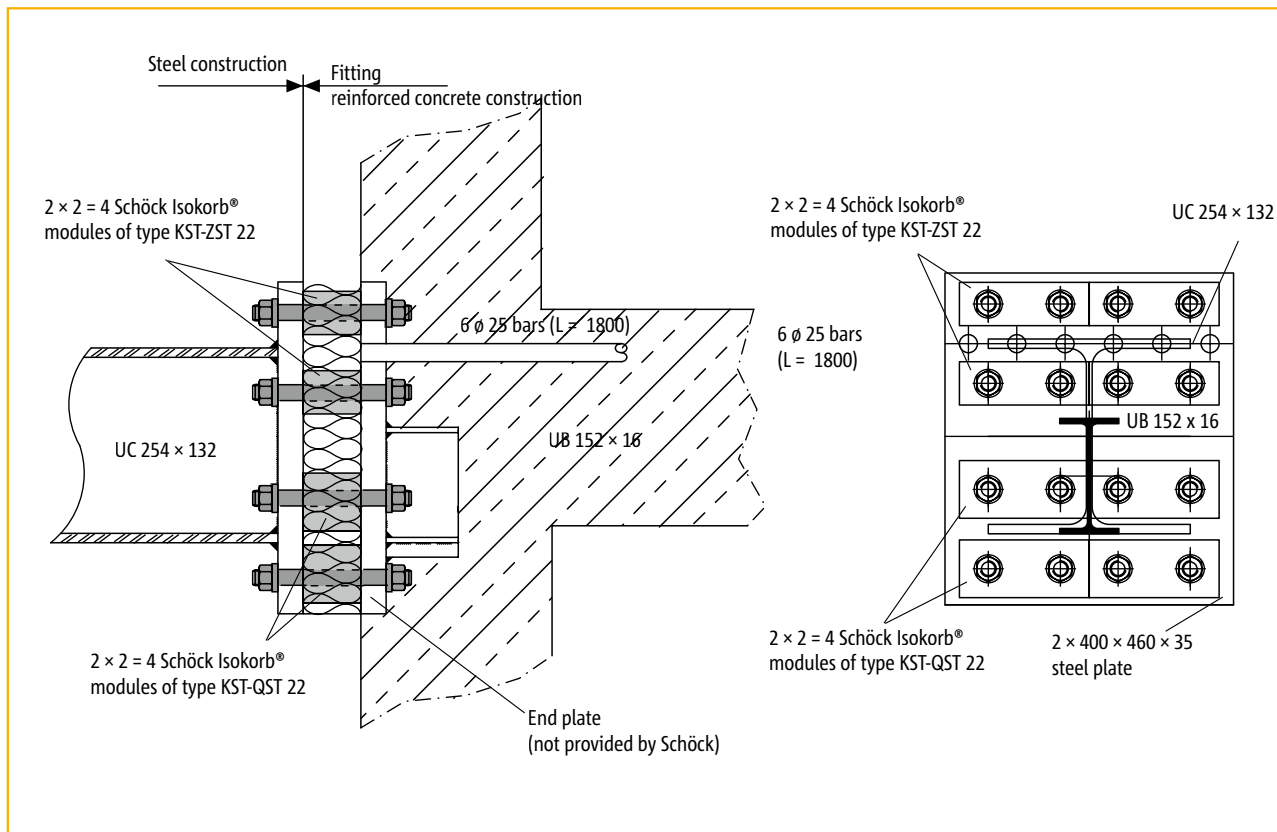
Schöck Isokorb® type KST for a renovation/retrofit balcony installation
